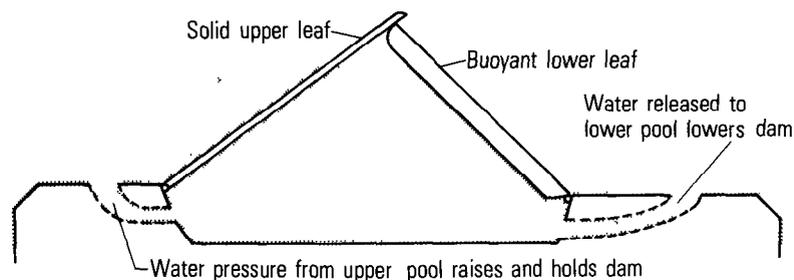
Bear-trap gate. (U.S. Army Corps of Engineers, 1952.)
